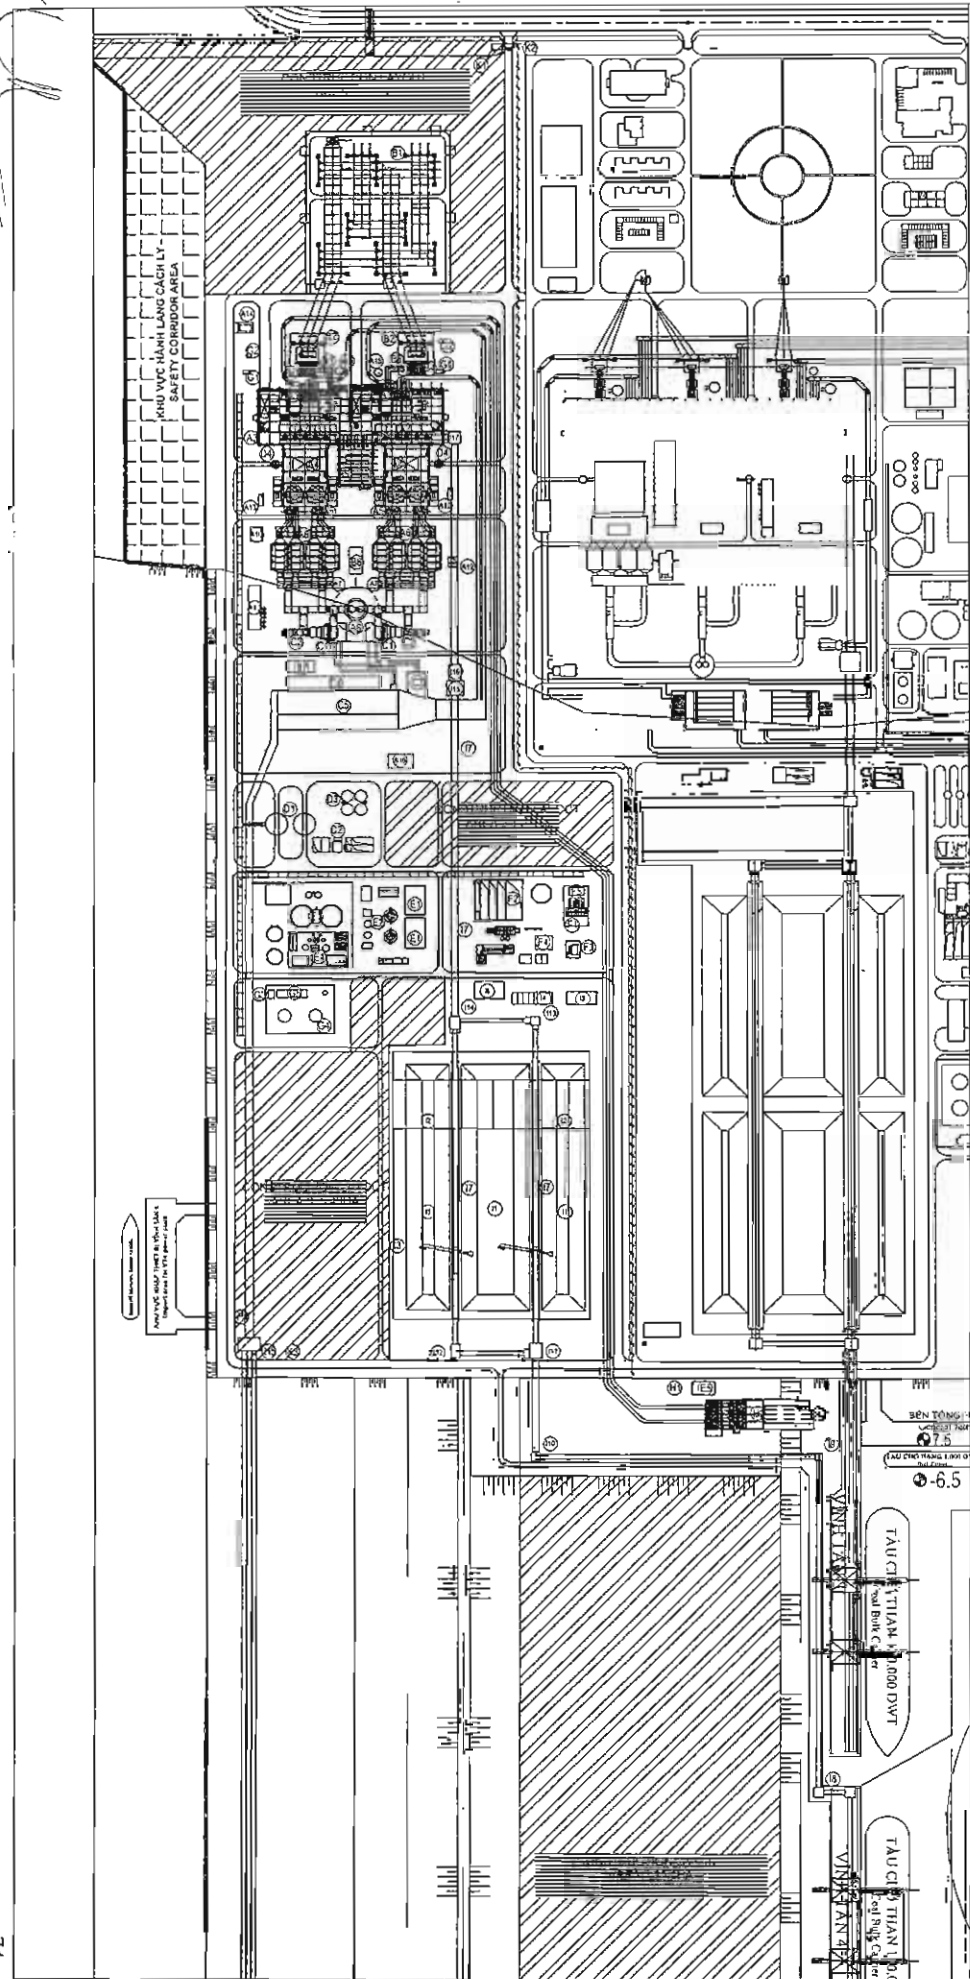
CONSTRUCTION LAYOUT OF VINH TAN 4 TPP
